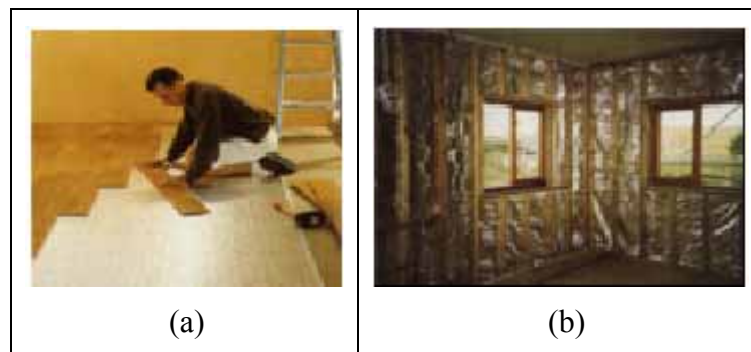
a –Floor Installation; b - Wall Installation [35]
